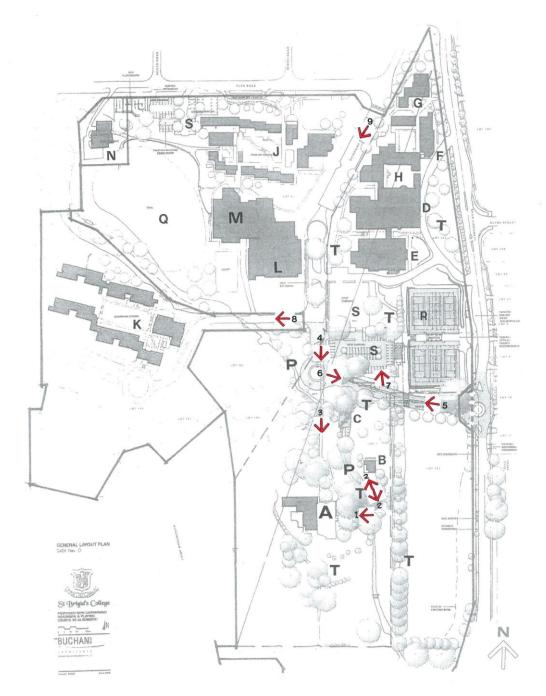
Significant Vistas, courtesy of the St. Brigid's College Conservation Plan
